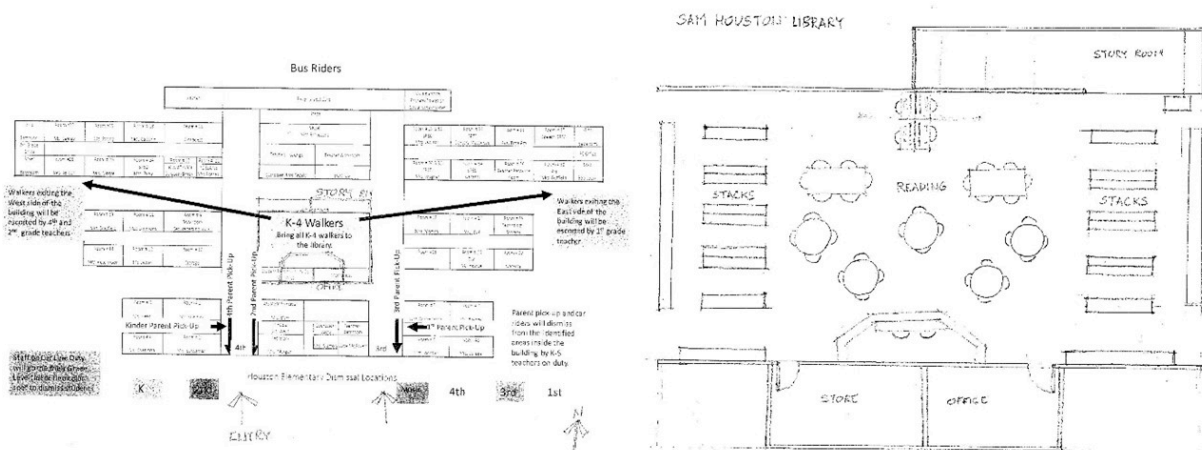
The plan of the library(right) constructed from the egress plan(left).
